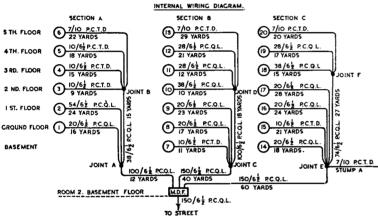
TYPICAL BLOCK WIRING SCHEMATIC.
